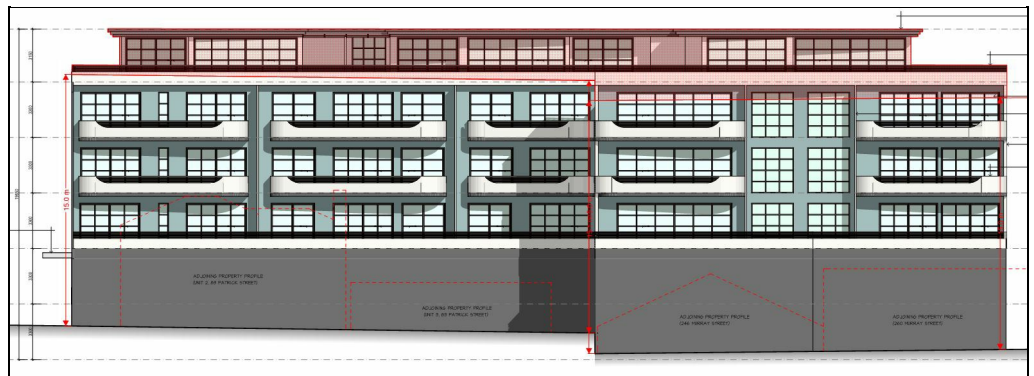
The north-eastern (rear) elevation of the proposed building. The height profiles of the adjoining buildings to this side can be seen dotted in in red at the bottom of the elevation. The elements of the proposed building above the compliant 15m height limit can be seen hatched in red at the top of the building.
